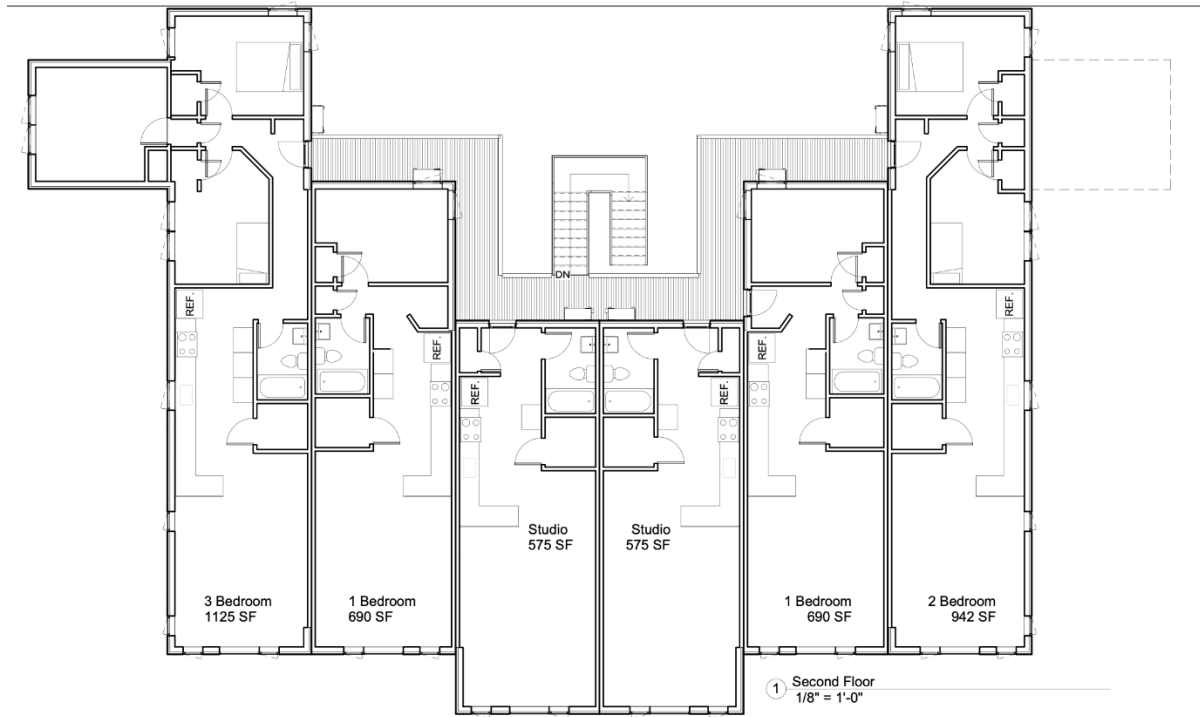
Floor Plan Layout for a Modular Multifamily Building Design.
